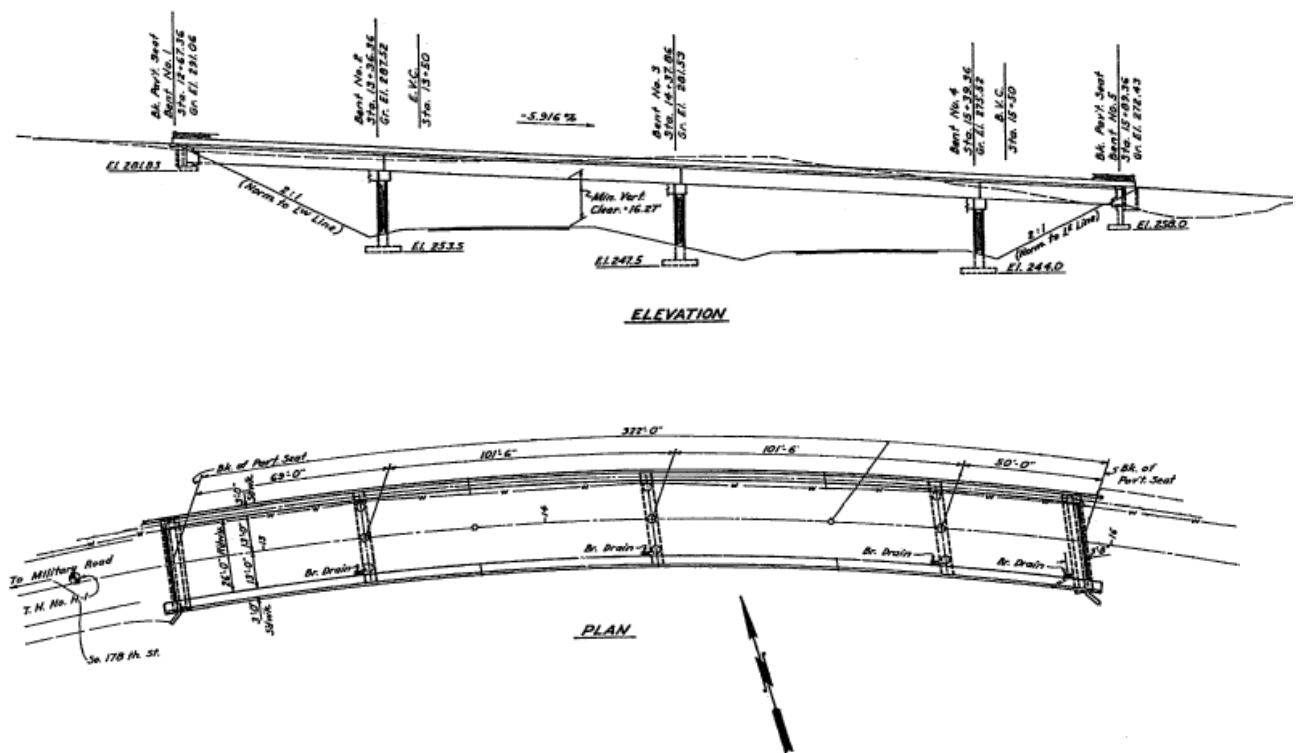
Plan and Profile Views of Bridge 5/518
